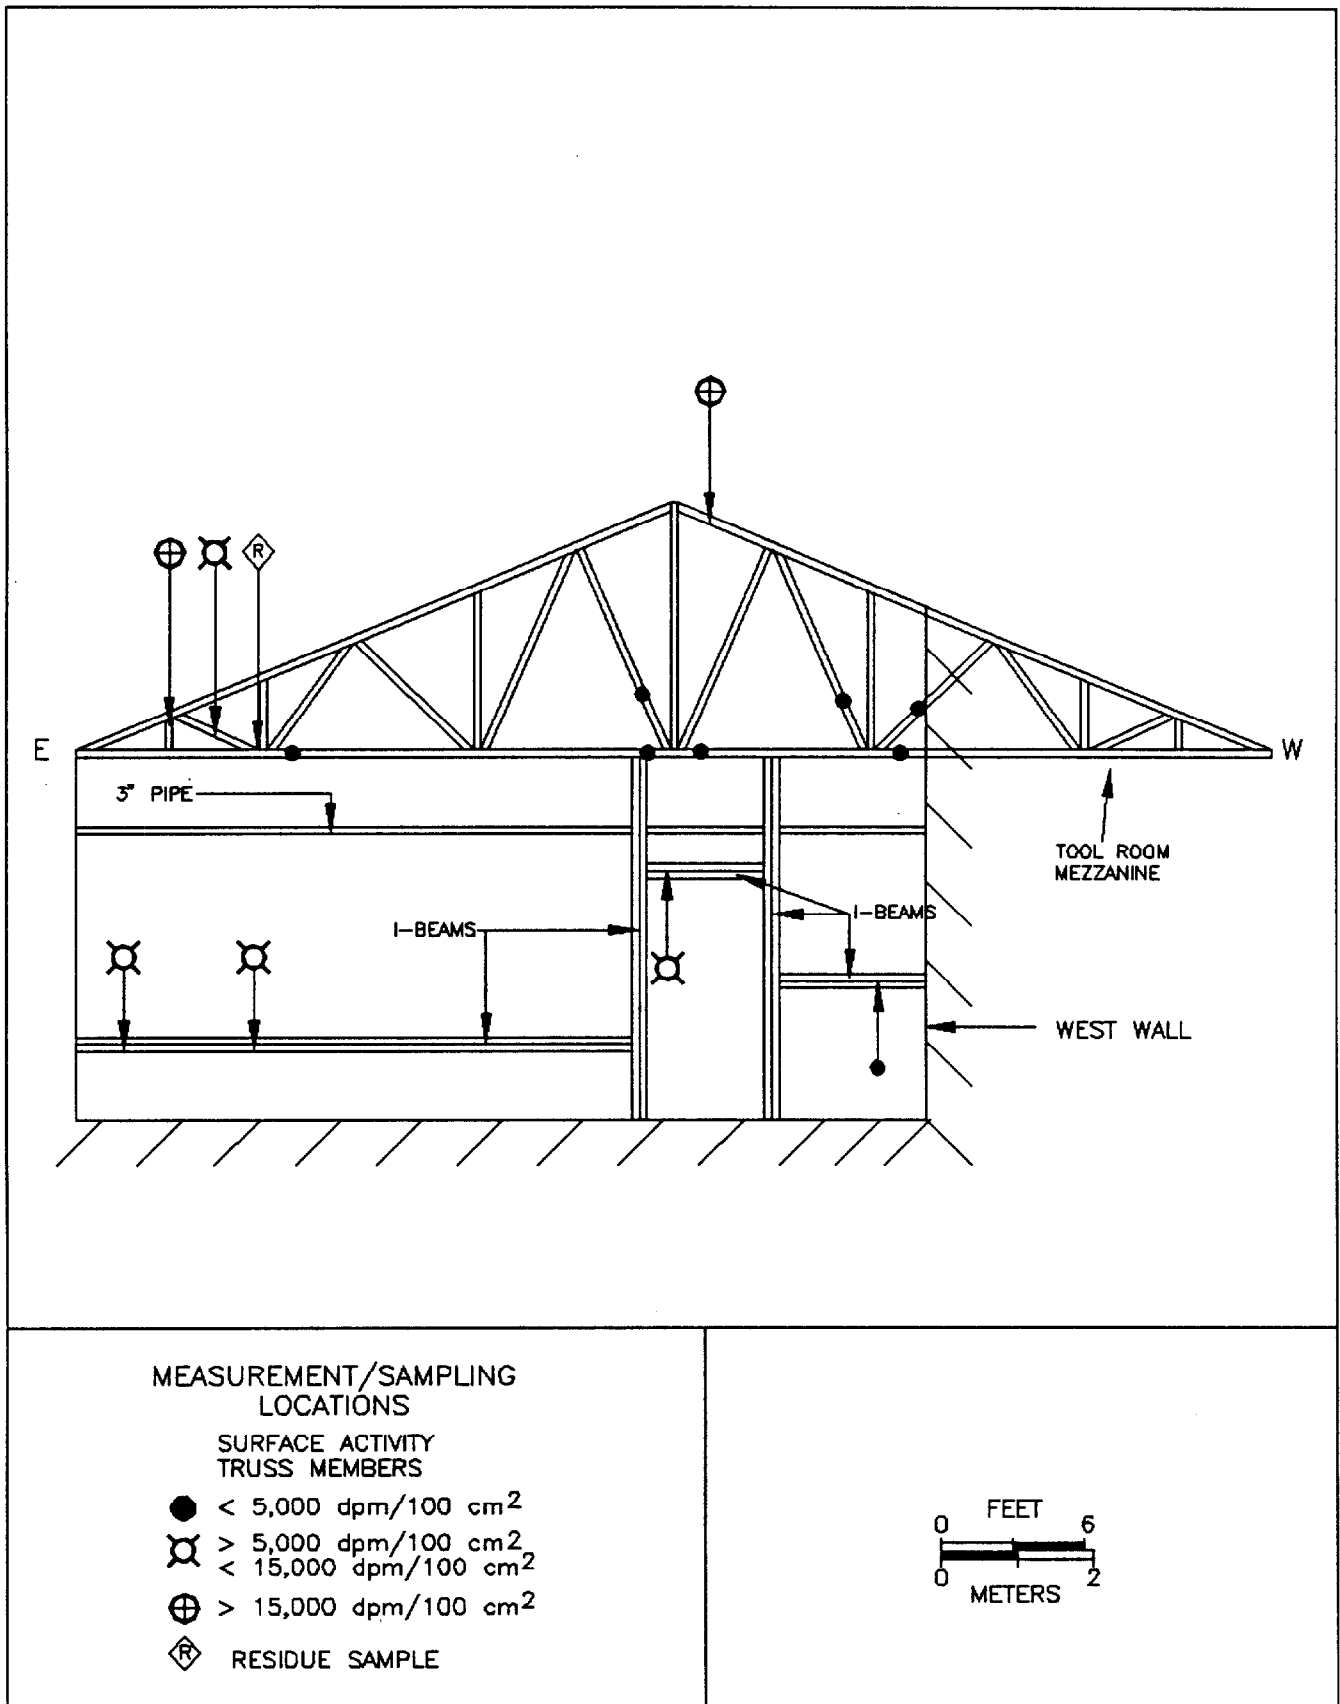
Building 8, Truss 1 (South Wall) – Measurement and Sampling Locations
